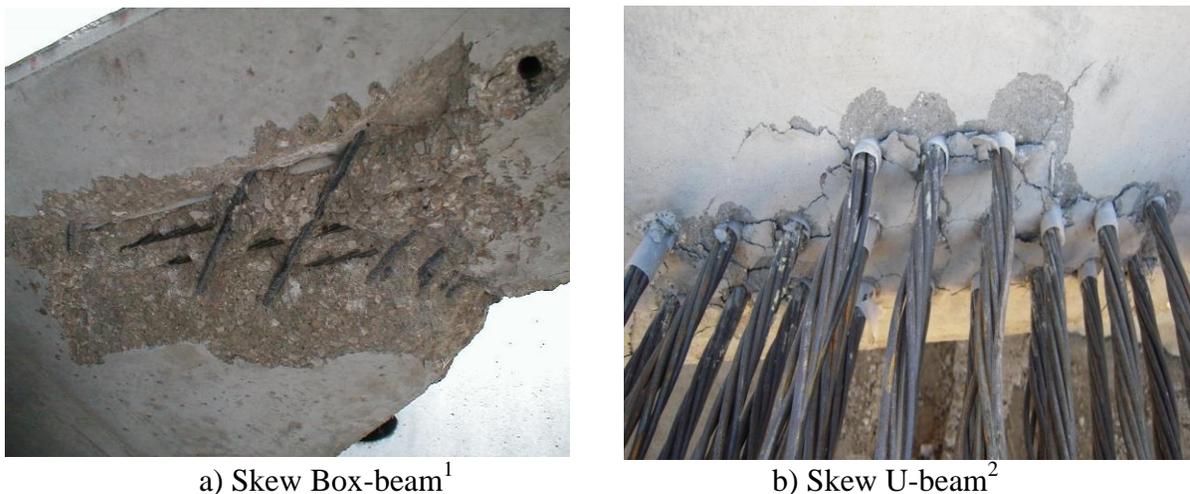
Damage at beam ends of prestressed bridge girders during production
